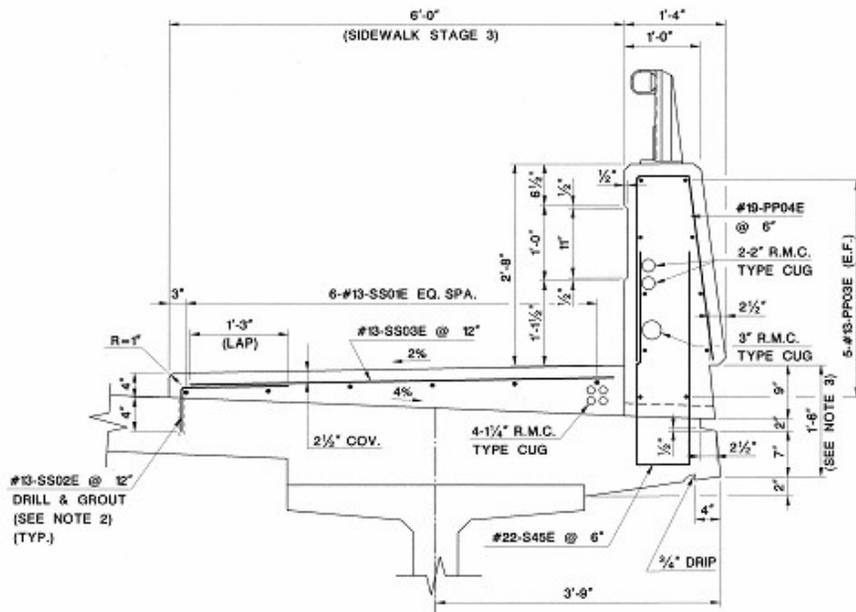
3'-5" High Parapet EB Sidewalk (South)
